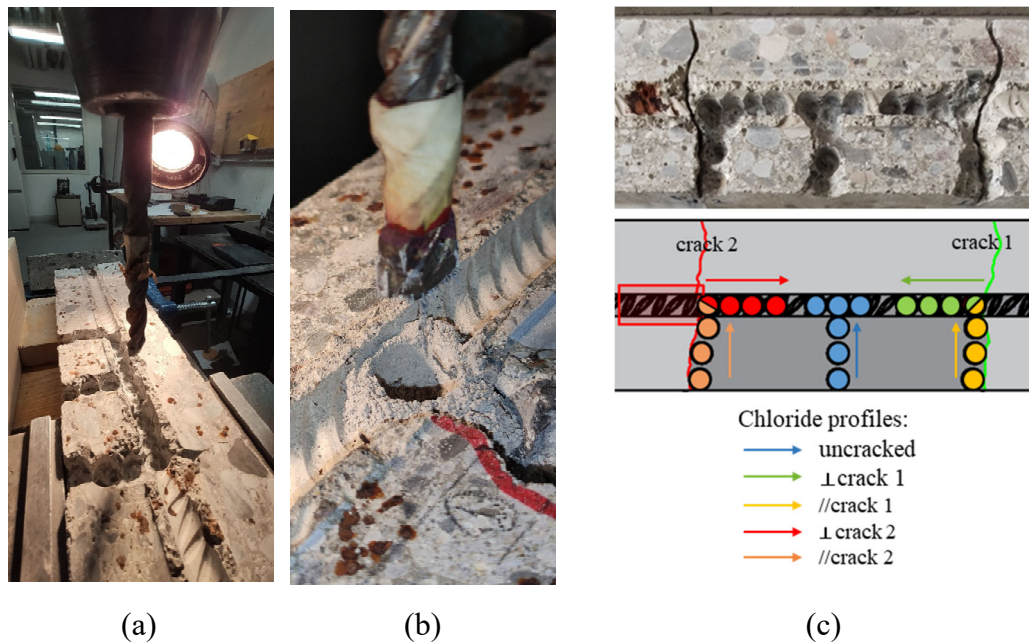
Powder sampling by column drilling machine for the evaluation of the chloride content (a,b); chloride profiles in uncracked concrete (blue), perpendicular to crack wall (red and green) and parallel to crack wall (orange and yellow) (c).
